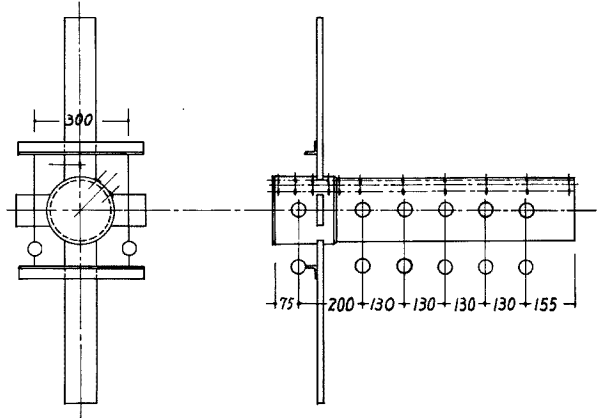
Typical wire strain gage location for “tension type” specimens—PJ-8.
